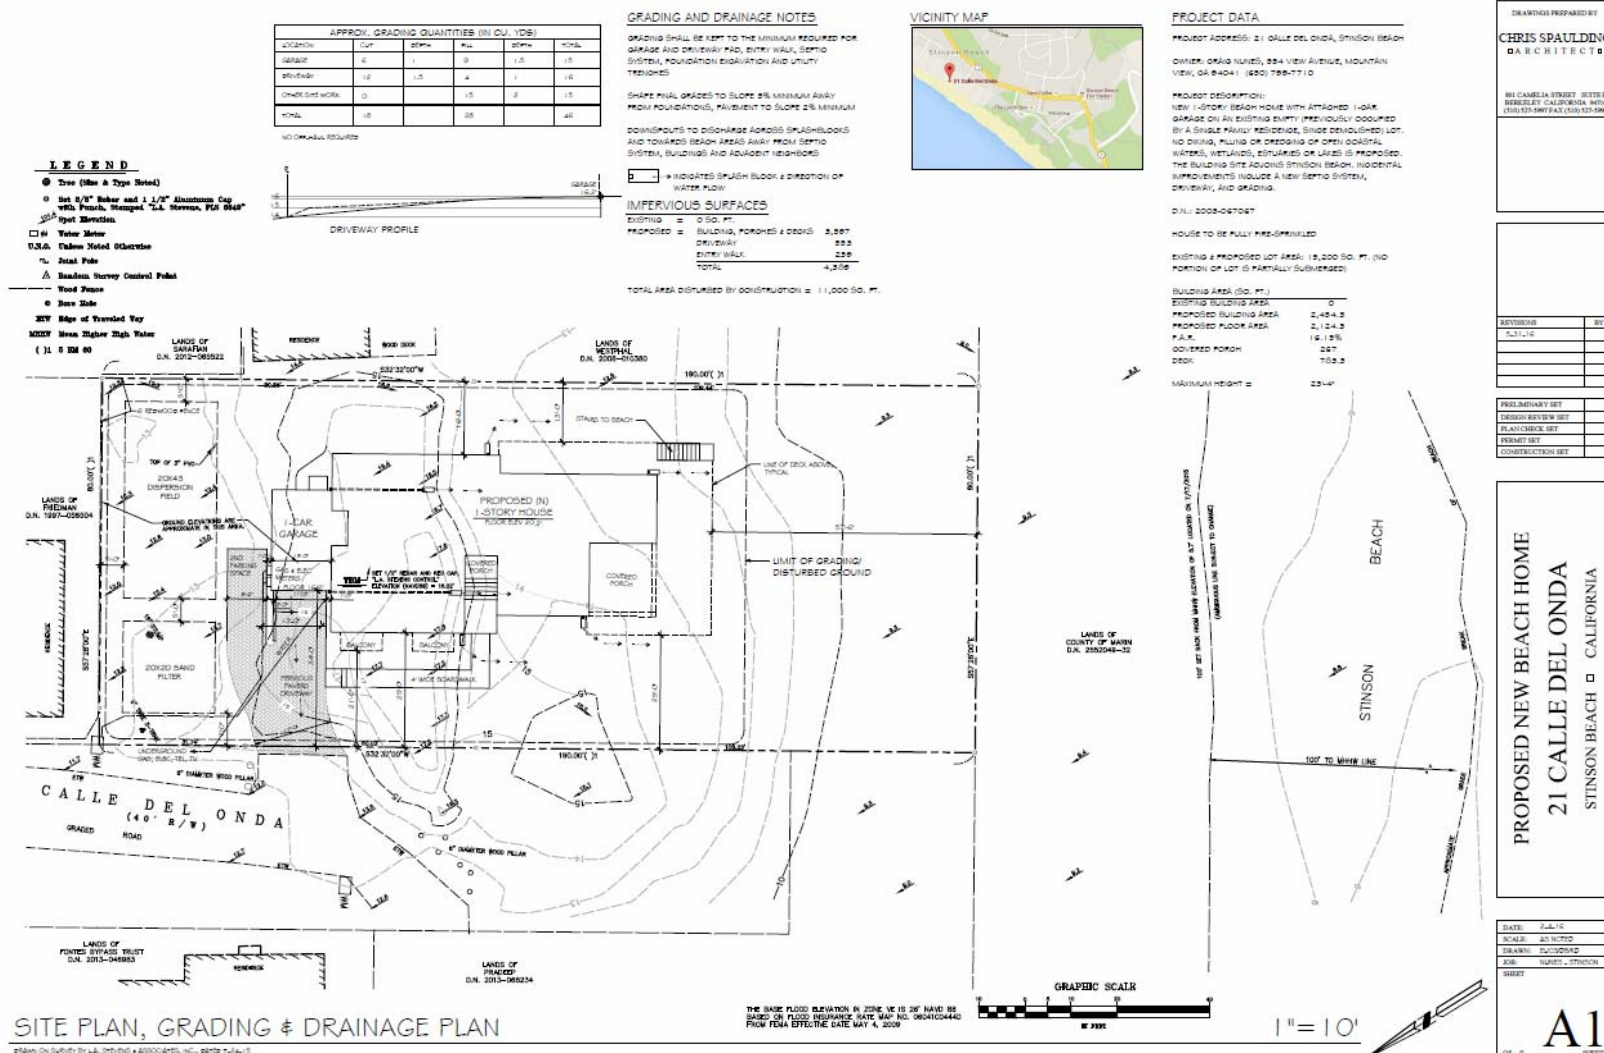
Topographic Survey Overlay with Site Plan for Proposed Development
